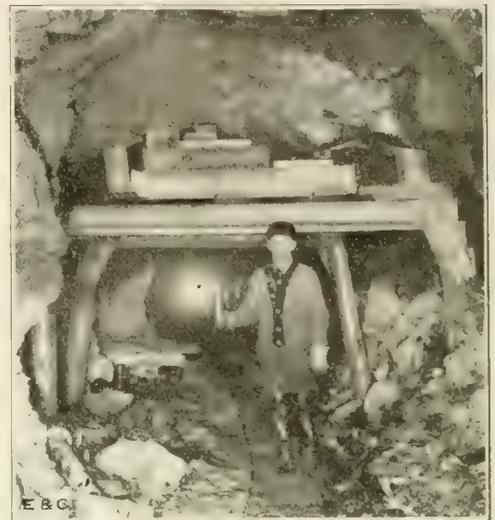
View of Timbering in Waban Hill Water Tunnel.
